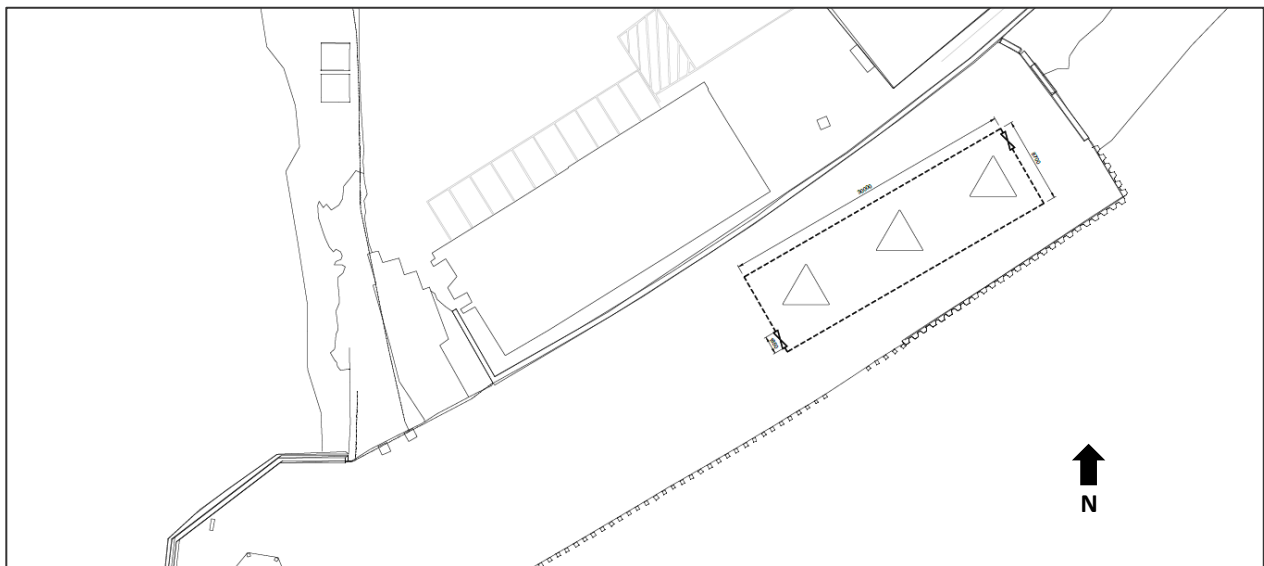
Indicative site layout at Proposed location of Tower Structures on North Pier
